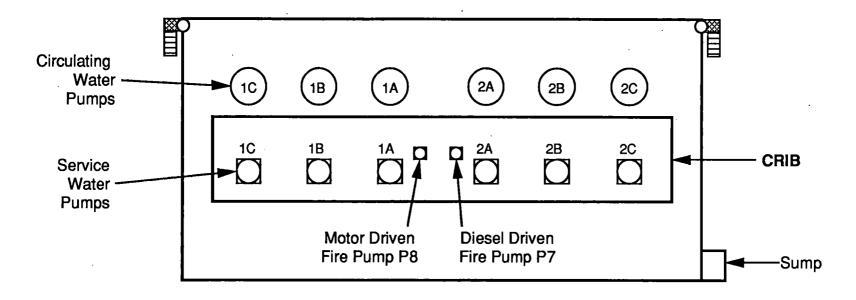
Zion 1 and 2 General Arrangement, Crib House
